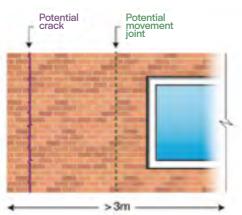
Corners are very stiff joints. A run of brickwork more than half the minimum allowance can lead to cracking near to the corners.
